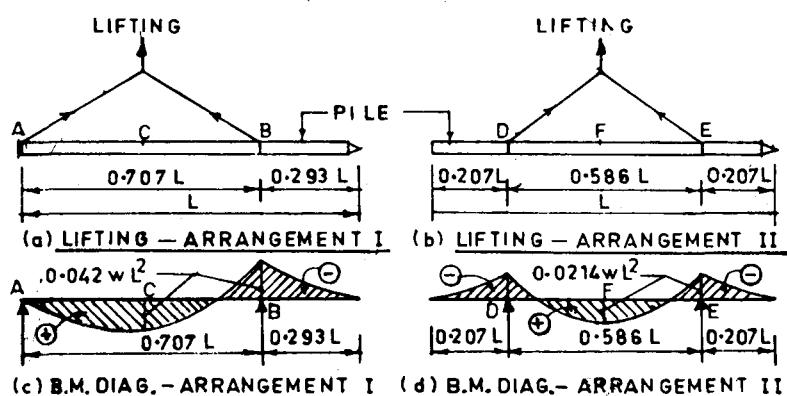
·6 DETAILS OF TWO-POINT LIFTING OF PILES
